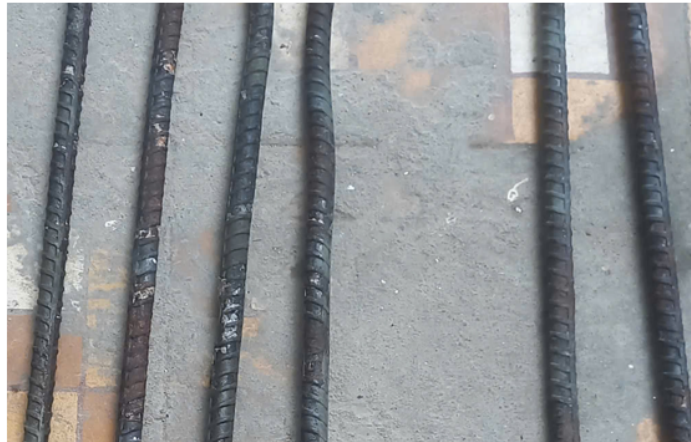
Surface of longitudinal reinforcing steel bars after testing
